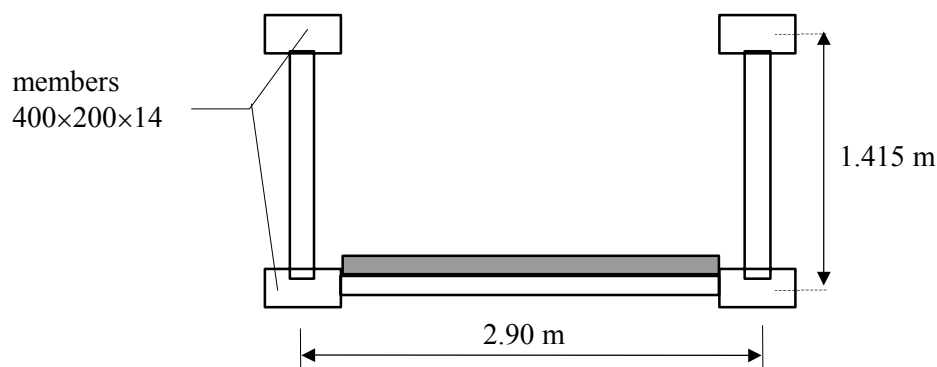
Cross-section of the footbridge with members in 14 mm sheet metal and depth of 1.415 m
